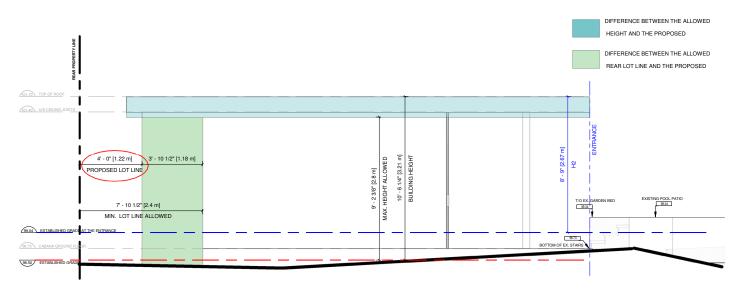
B- Proposed South Elevation With Rear Yard Setback
